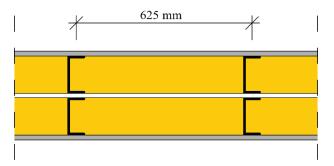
Cross section of the examined double metal stud wall construction $(2 \times 12.5 \text{ mm gypsum plasterboard}, 75 \text{ mm insulation material}, 5 \text{ mm air}, 75 \text{ mm insulation material}, 2 \times 12.5 \text{ mm gypsum plasterboard})$
